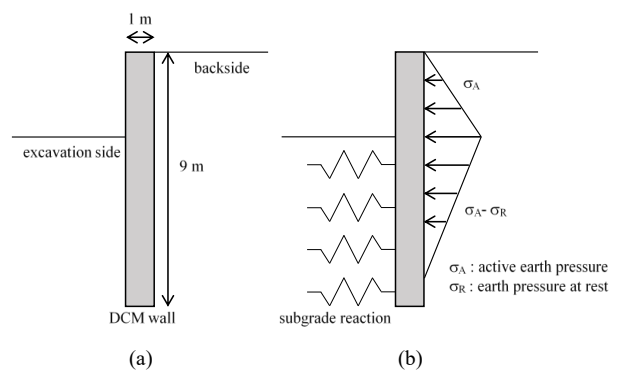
Self-supported DCM wall to be considered in this study. (a) dimension of DCM wall (b) loading condition.
